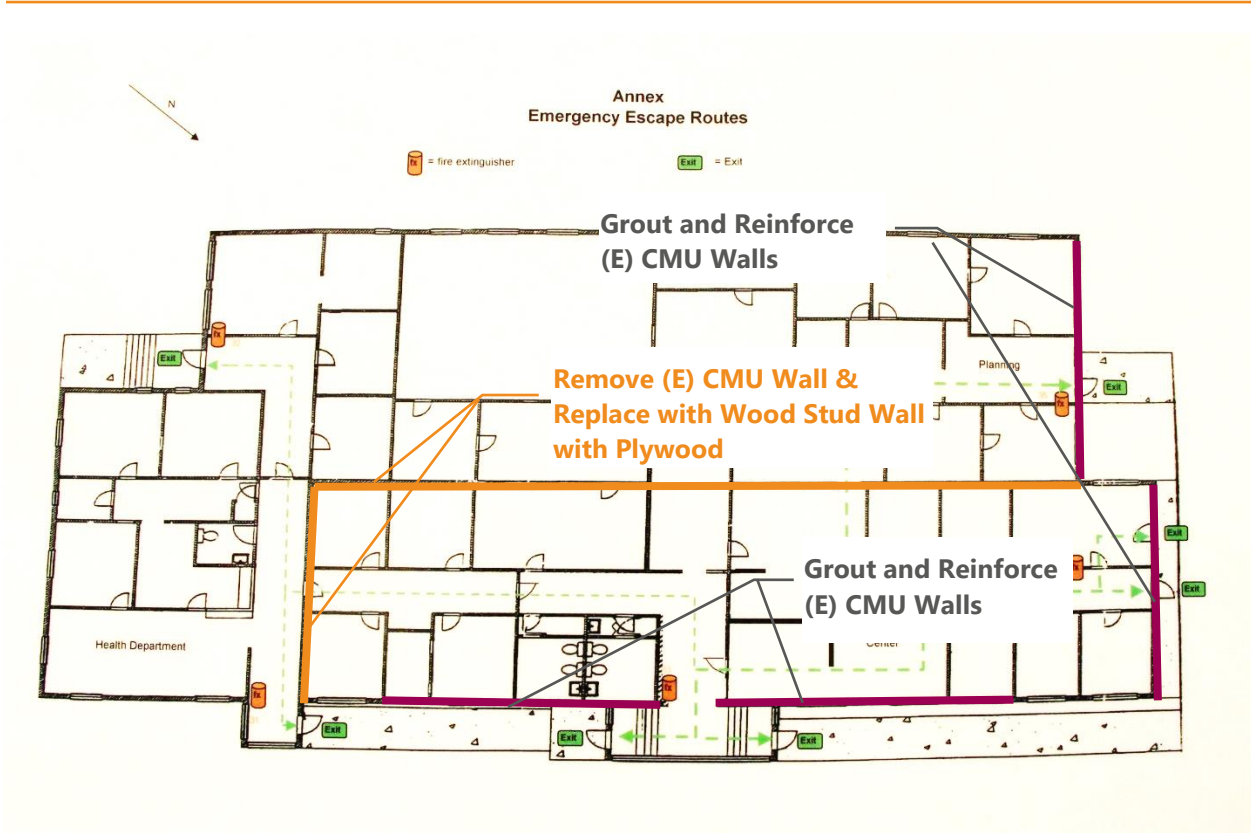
Conceptual Seismic Strengthening of Shear Walls at first story of the Annex Building, annotated in orange, over existing escape route plan developed previously by the County.
